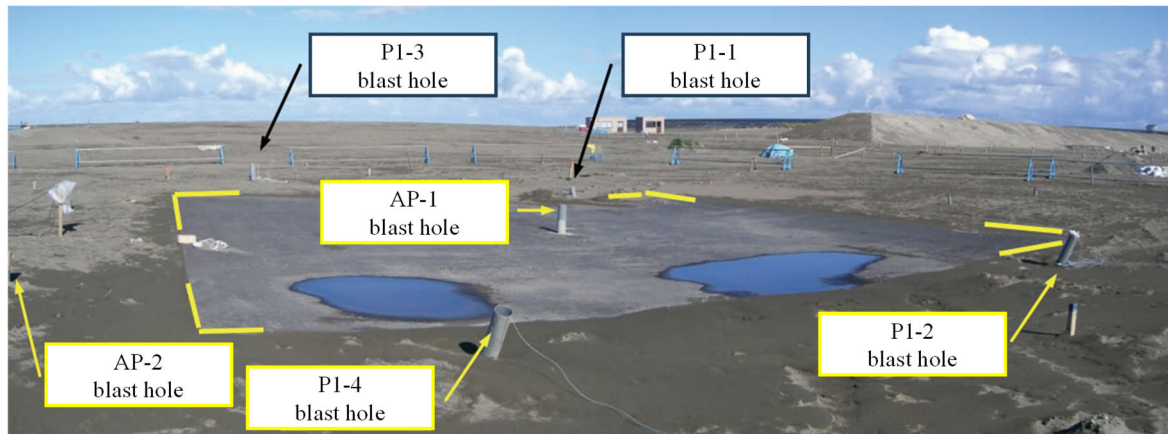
Test pavement after liquefaction in a full-scale liquefaction experiment
